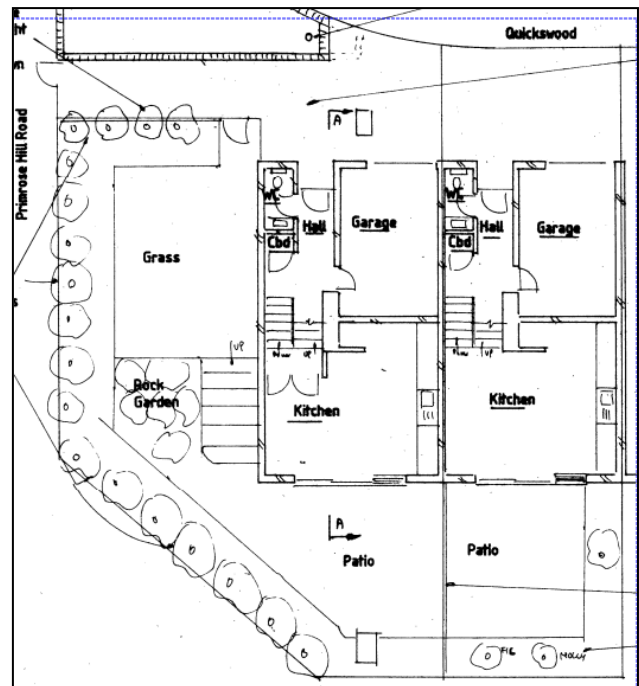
(above): Proposed site and ground floor plan at 65 Quickswood for 2006/1426/P. This plan shows that a large setback is retained for the proposed building in relation to the junction of Adelaide Road and Primrose Hill Road. The retention of a noticeable gap is in keeping with the general pattern of the Chalcot Estate and the surrounding area.
